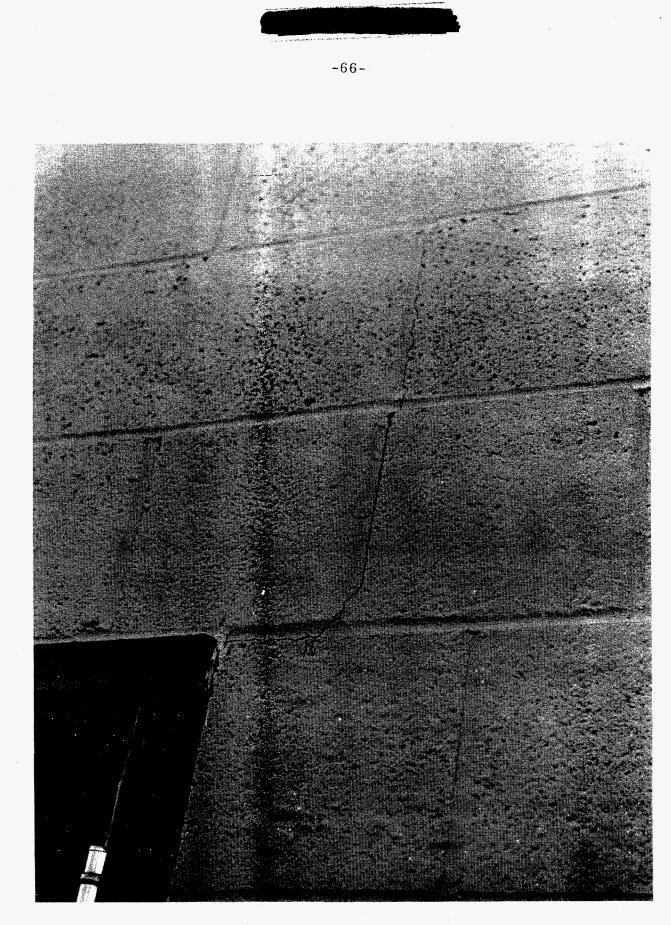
Building 701, north end of east side, crack over fan room door, 0.13 cm/sec.
